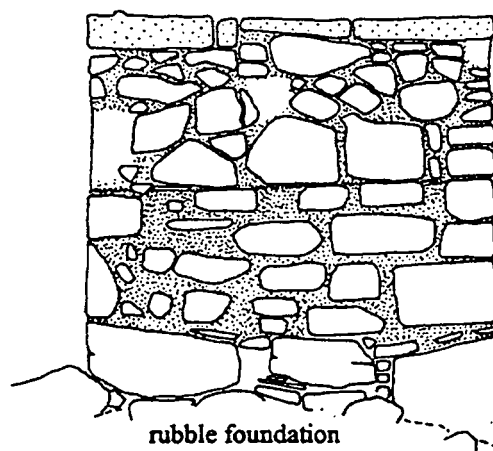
CAU's elevation drawings of St. Ruan's Well, Grade
